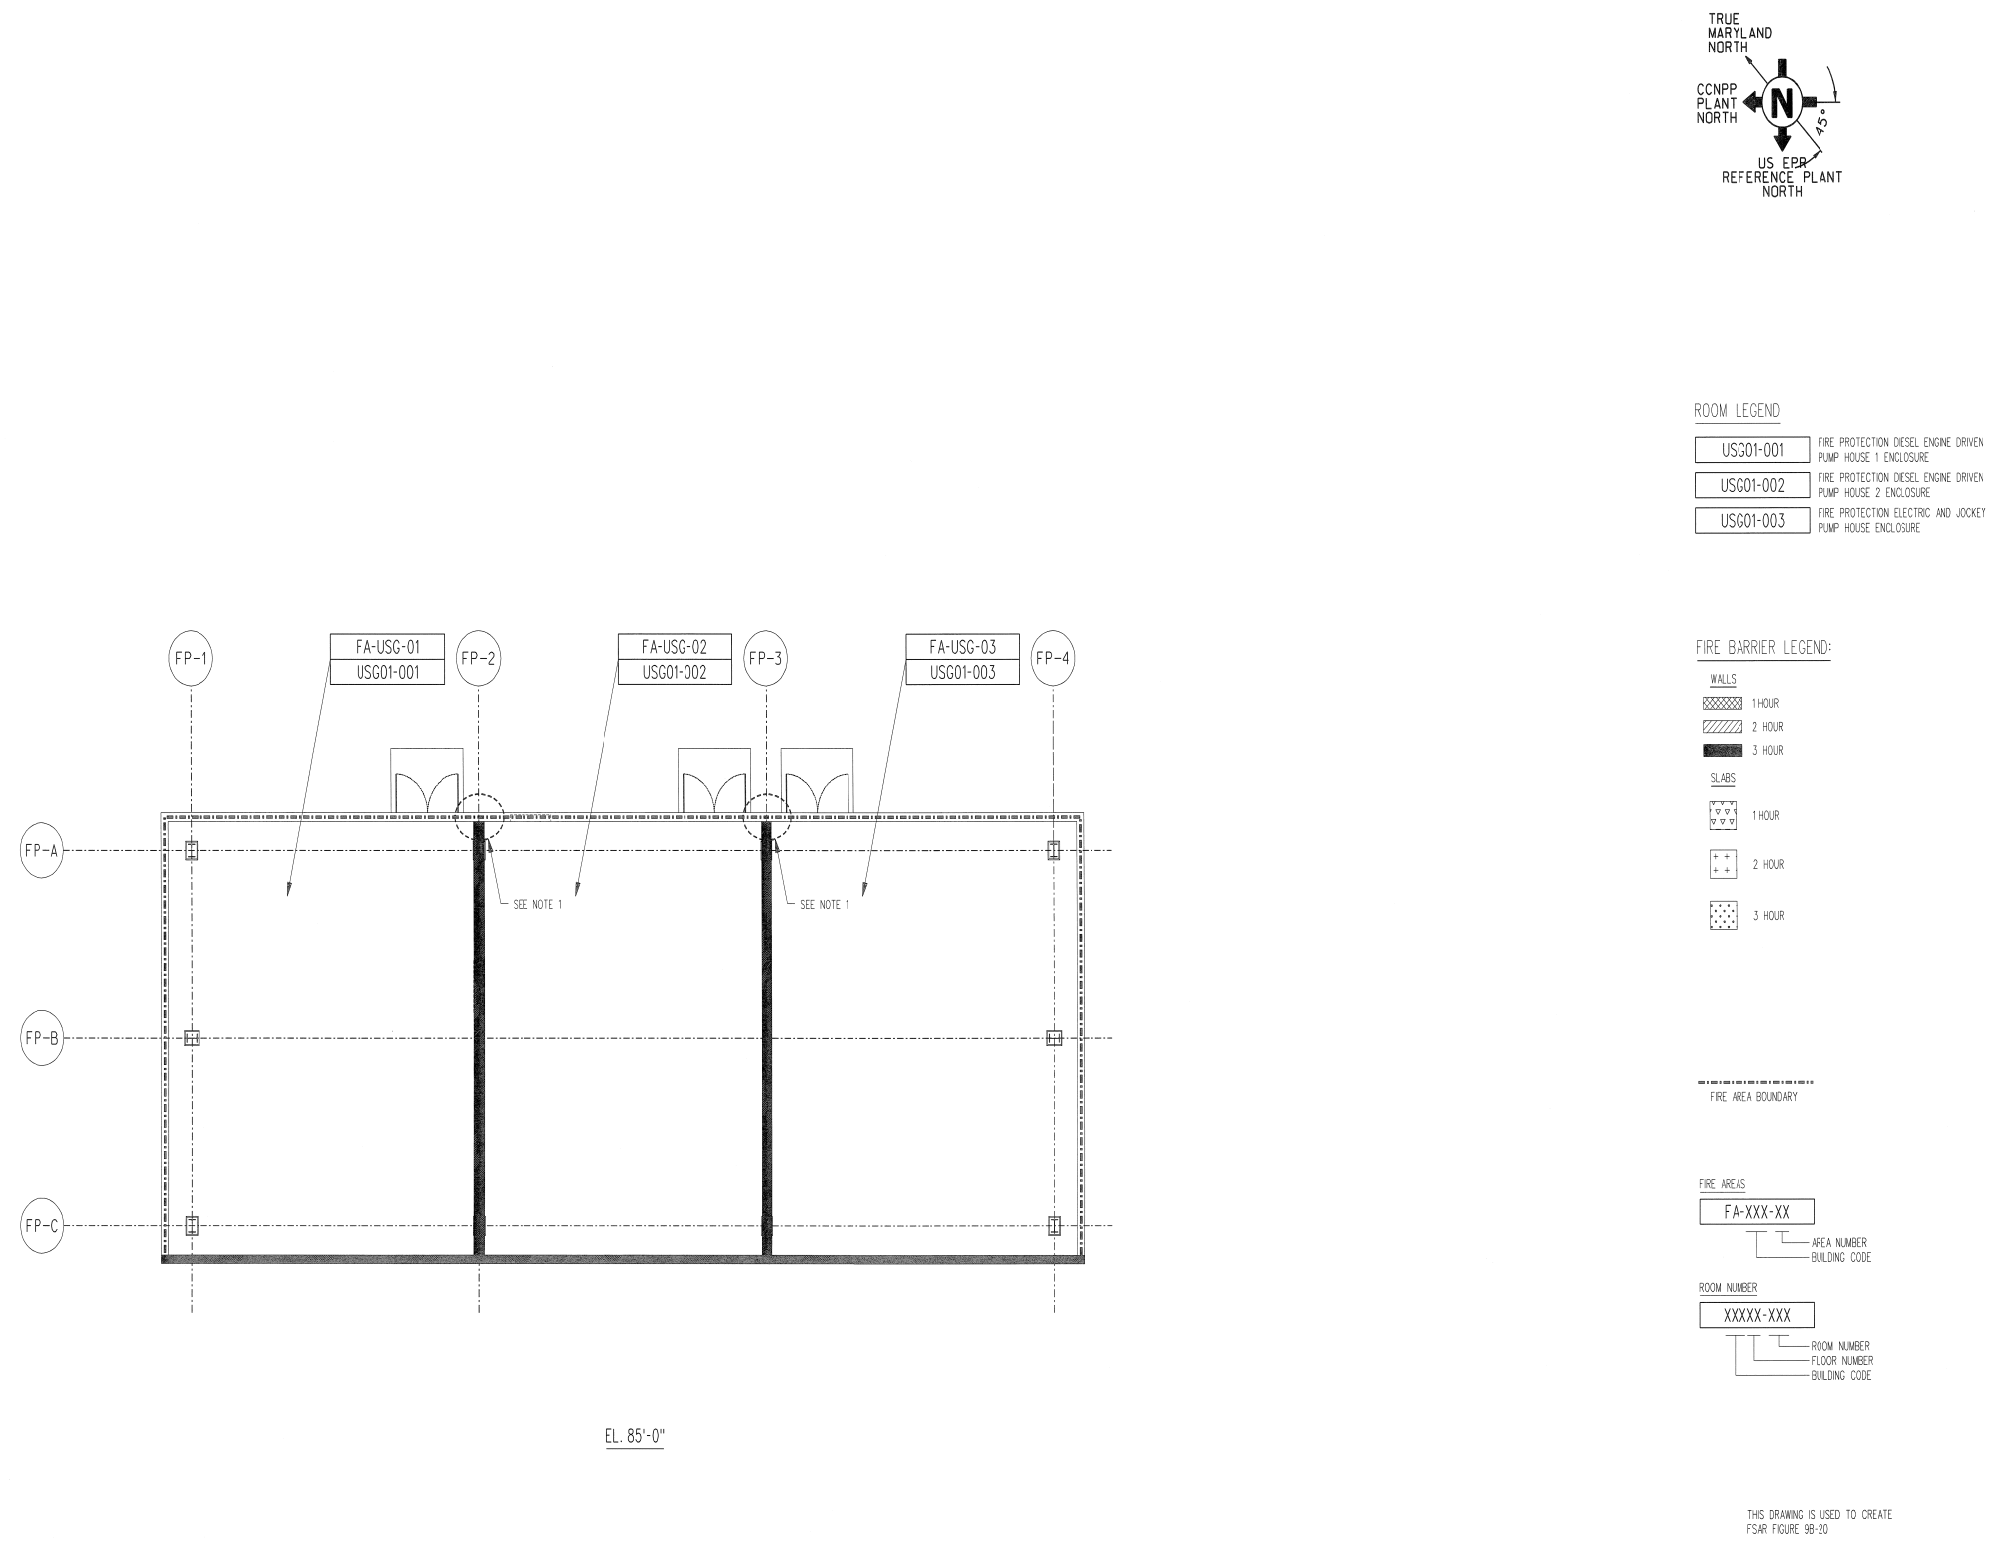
B-20 — CCNPP Unit 3 Fire Barrier Location, Fire Protection Building Plan View at Elevation 85'0"
